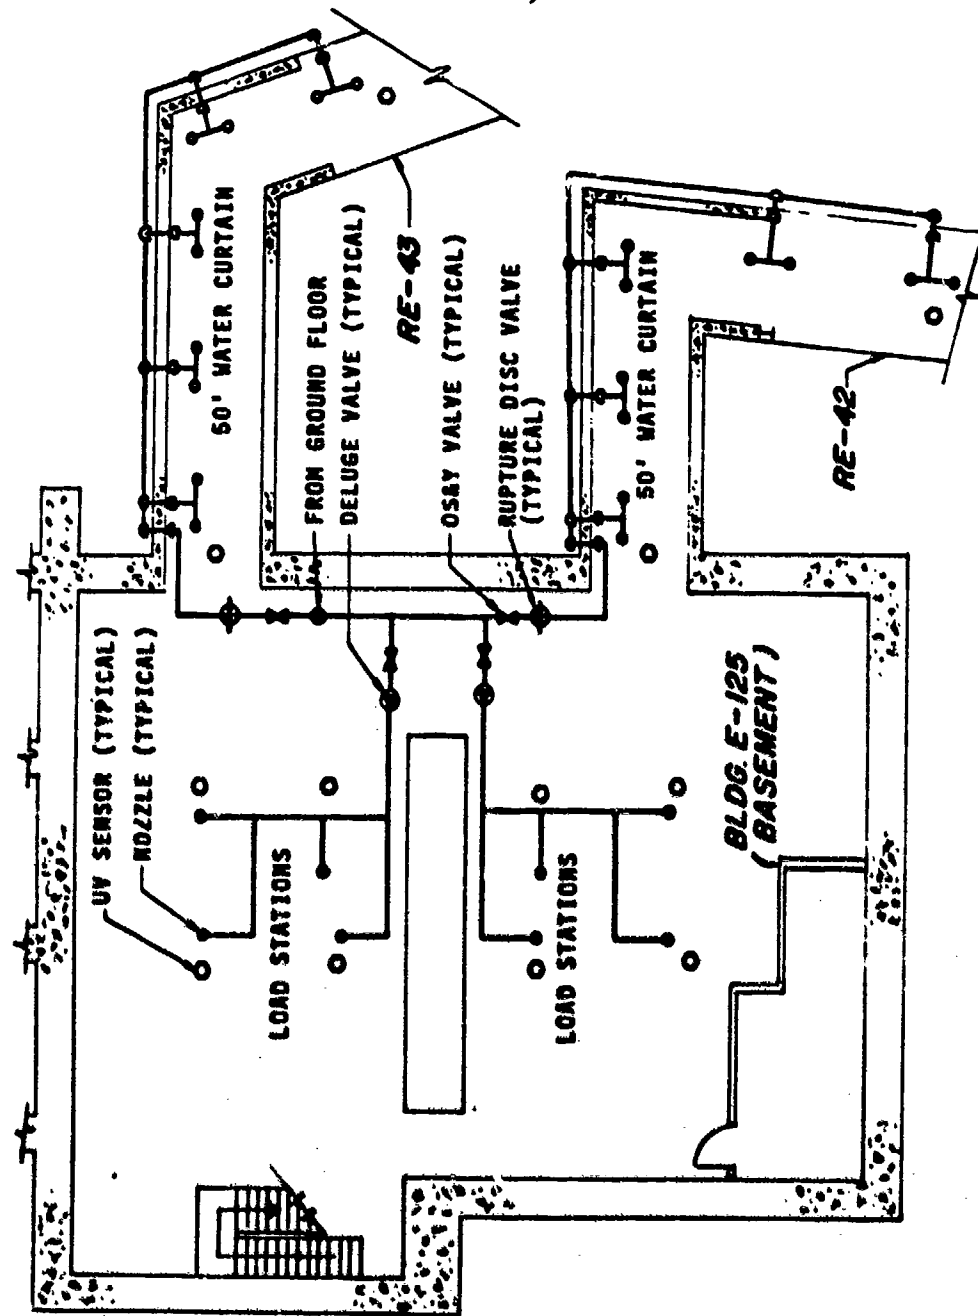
Schematic - Building E-125 (basement) and Ramps RE-42 and RE-43
